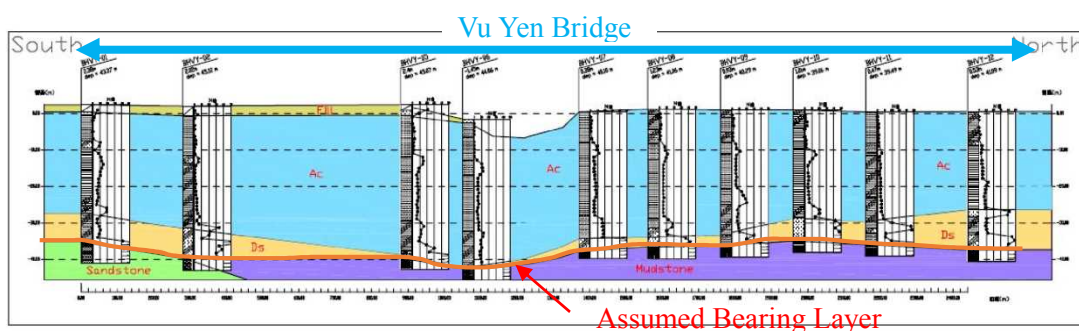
Soil Profile of Vu Yen Bridge Location
